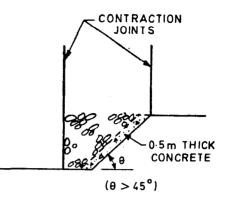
TREATMENT OF FOUNDATION GRADES HAVING STEPS IN THE CASE OF MASONRY SPILLWAY
